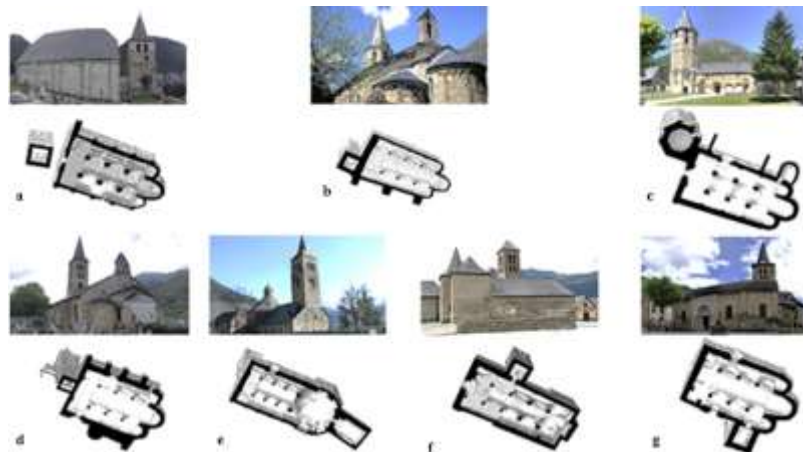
Church Plan and section of studied church; a) Santa María de Cap d'Aràn de Tredós; b) Santa Eularia d'Unha; c) Sant Andreu de Salardú; d) Santa Maria d'Arties; e) Sant Félix de Vilac; f) Santa Maria de Vilamós; g) Era Purification de Bossost.
